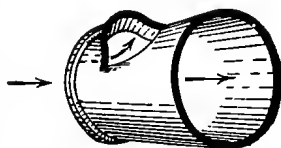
Typical outlet pipe, Deer Island outfall.
